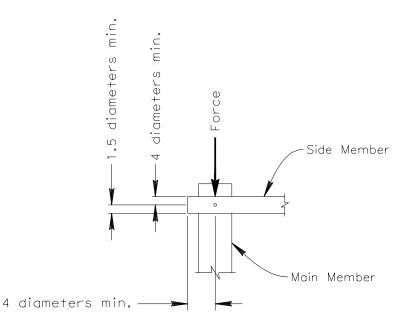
Bolted Connection Perpendicular-to-Grain Loading.
